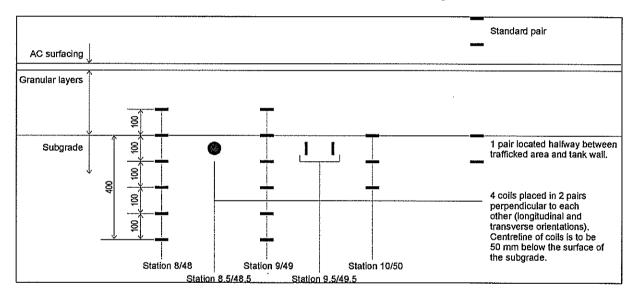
Layout of the Bison Soil Strain instrumentation (Sections A & C)
